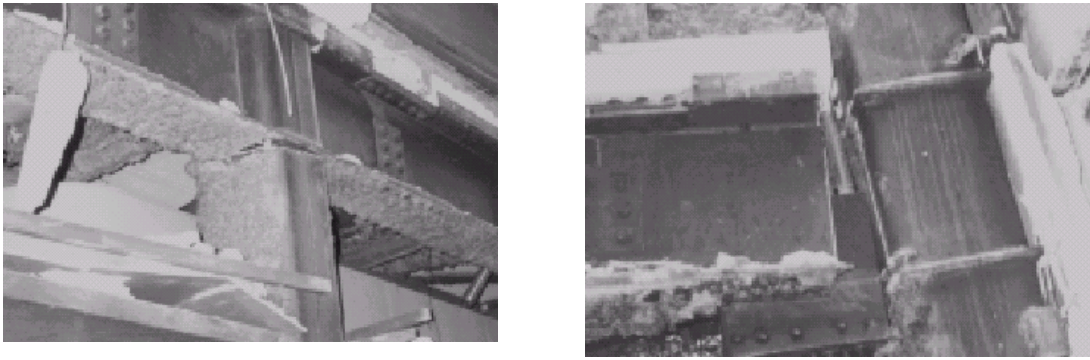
Damage at welded beam-to-column connections: fracture at column top (*left*) and beam end (*right*) in the Kobe earthquake (*after* FEMA 355E, 2000).
